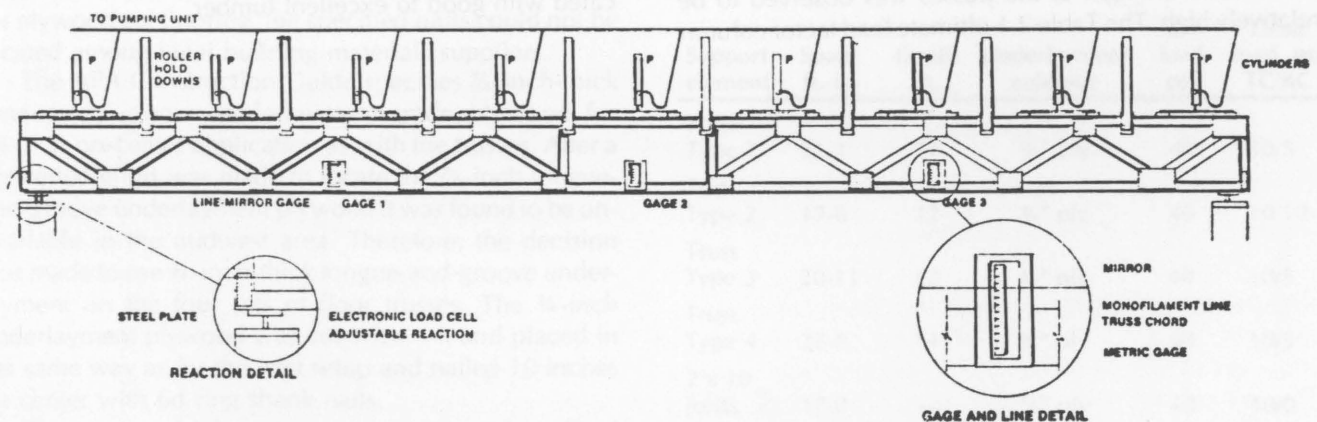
Typical loading and deflection arrangement for short-term test set-up. Loading points and gage location varied according to truss dimensions (see Figure 1.1).
